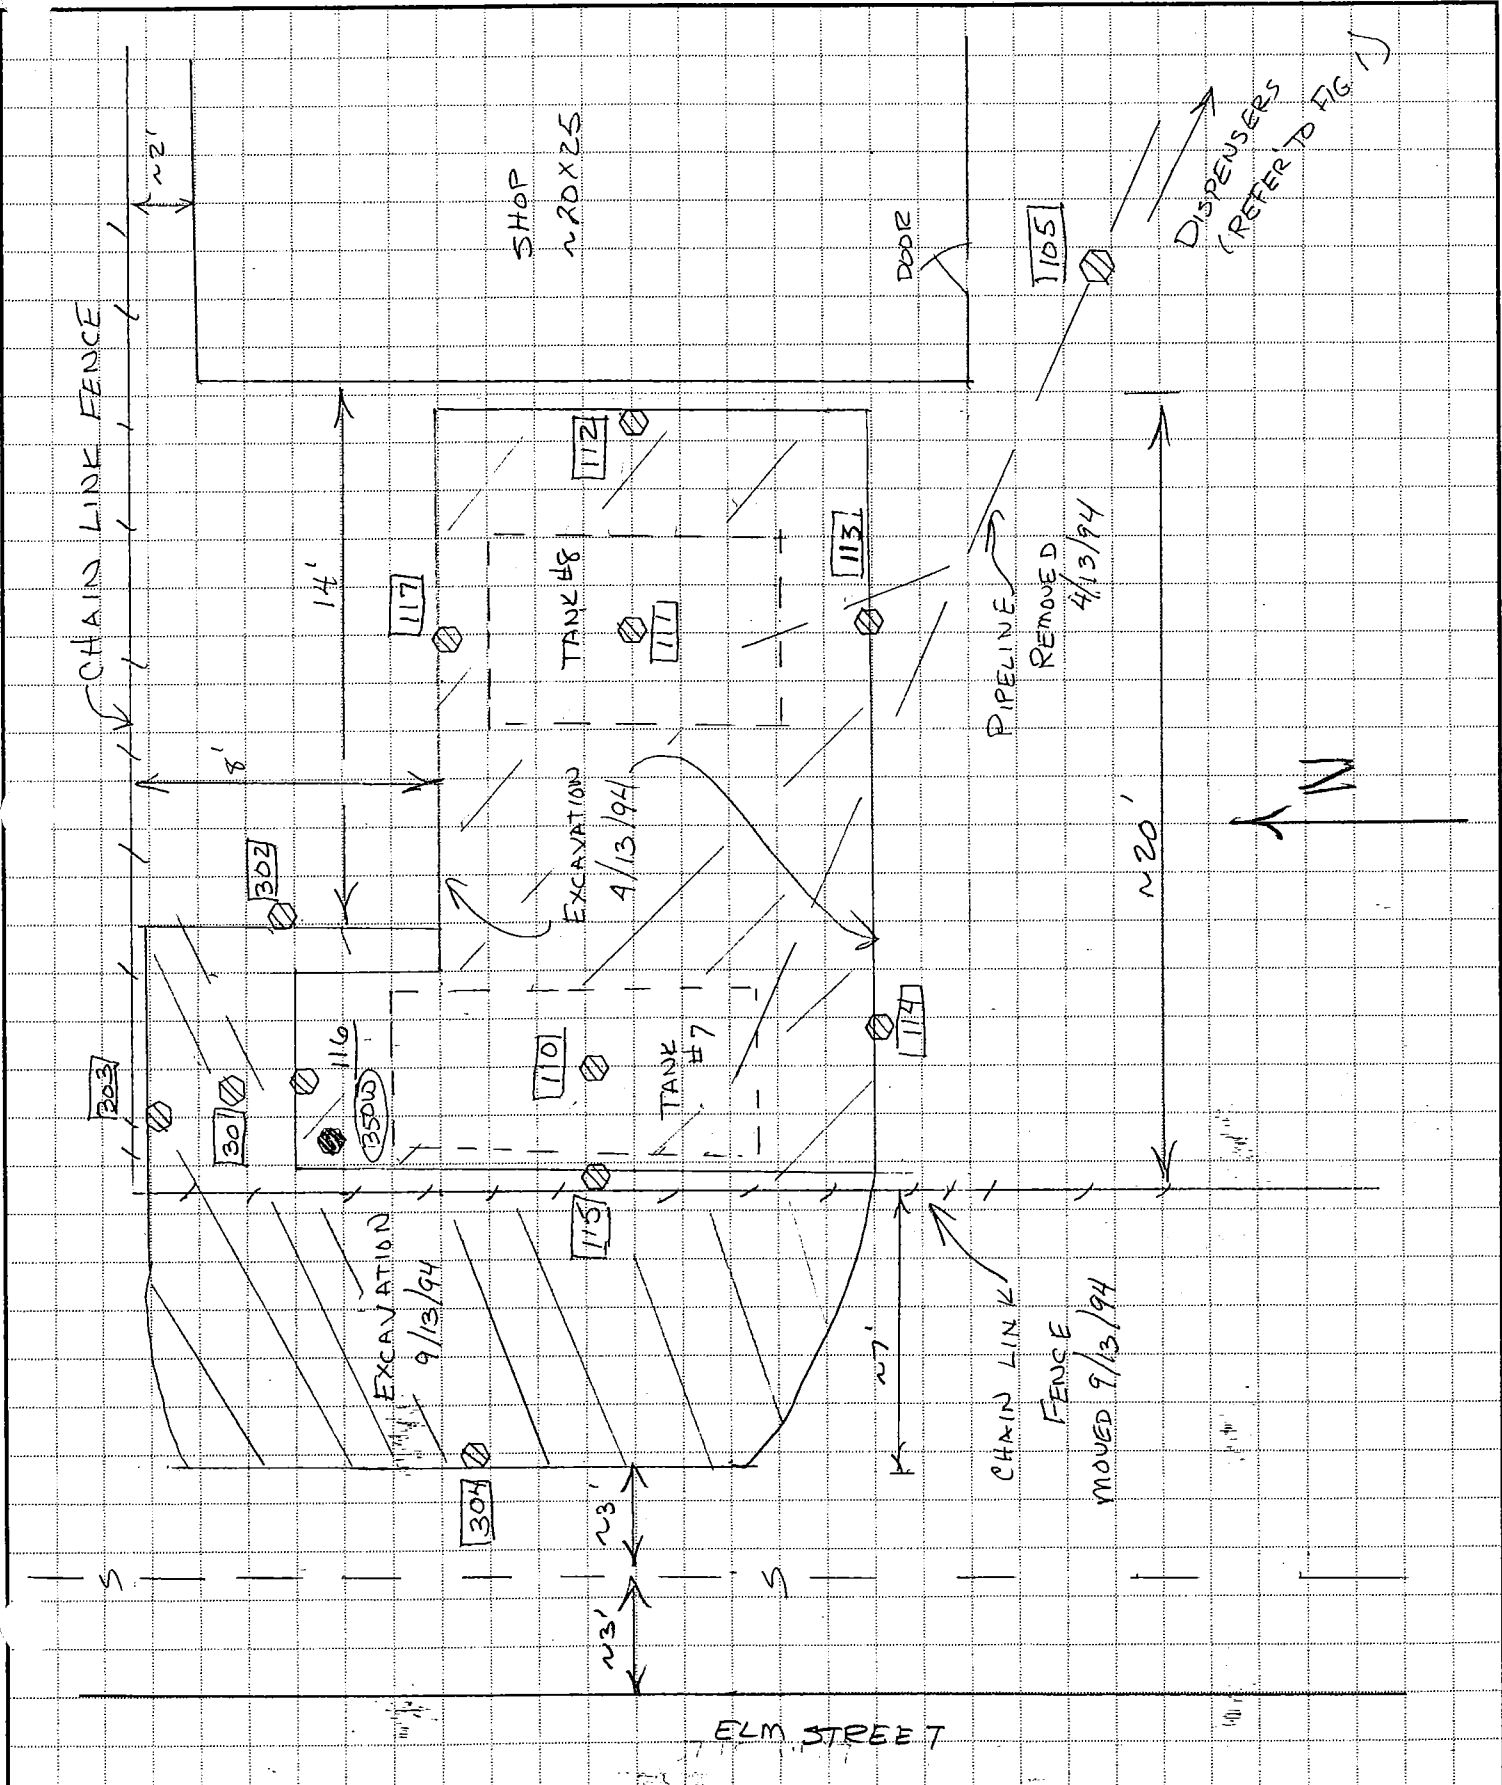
SAMPLING PLAN - EXCAVATION DETAIL
